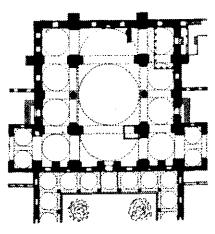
Constantinople: Sultan Beyazid Ground Plan
